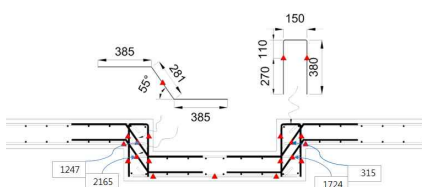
Strain of inclined rebar of specimen-4
